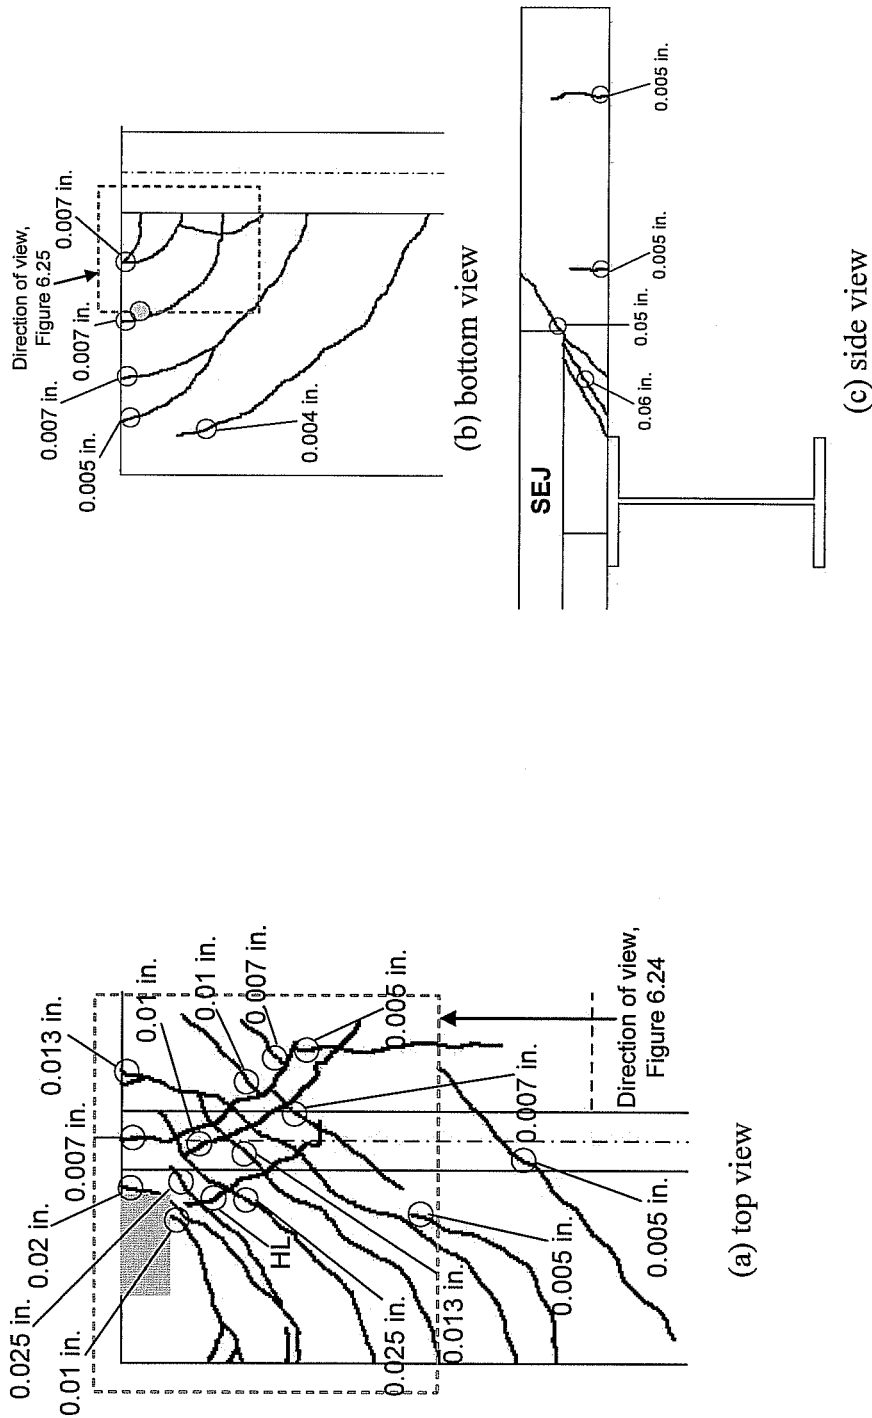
Crack map at failure, Overhang Test Area 3, SEJ: (a) top view; (b) bottom view; (c) side view, facing south
